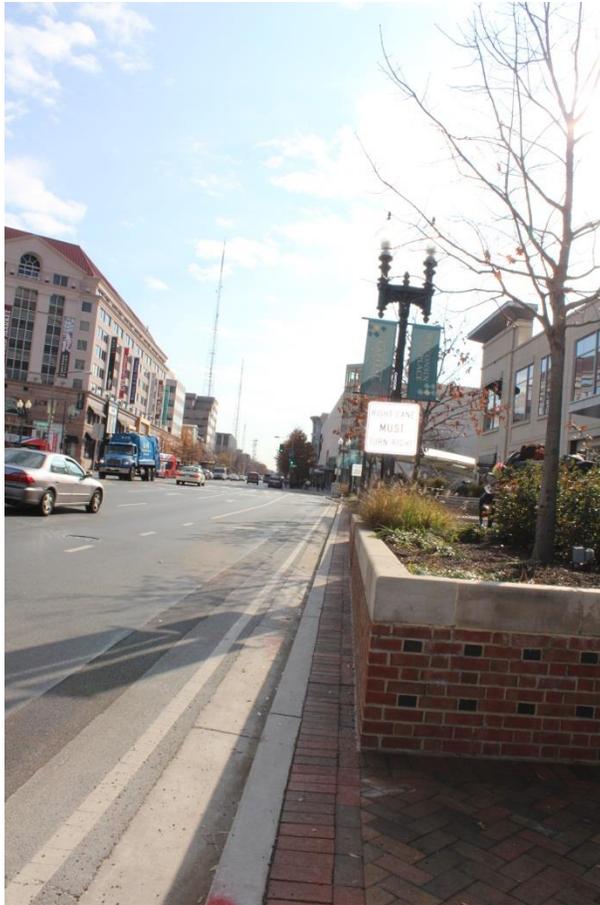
Photo. View of the planters located between the southbound lanes of traffic and the adjacent sidewalk along Wisconsin Avenue.
